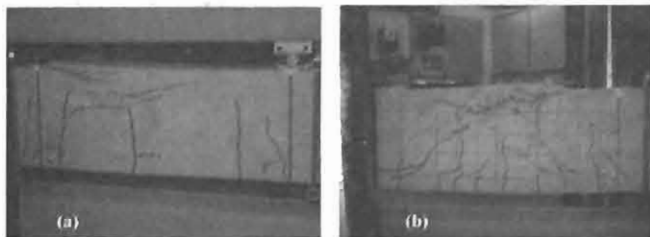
Final crack patterns for beams: (a) Specimen C4N0; and (b) Specimen C4P1.
